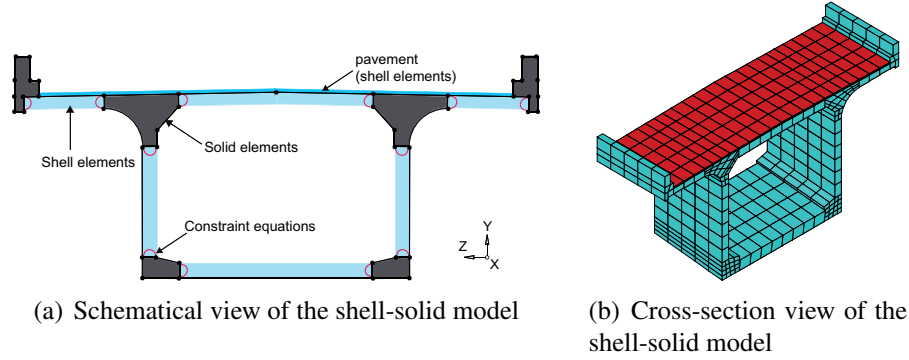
Grand-Mere Bridge cross-section and isometric view of the shell-solid model
